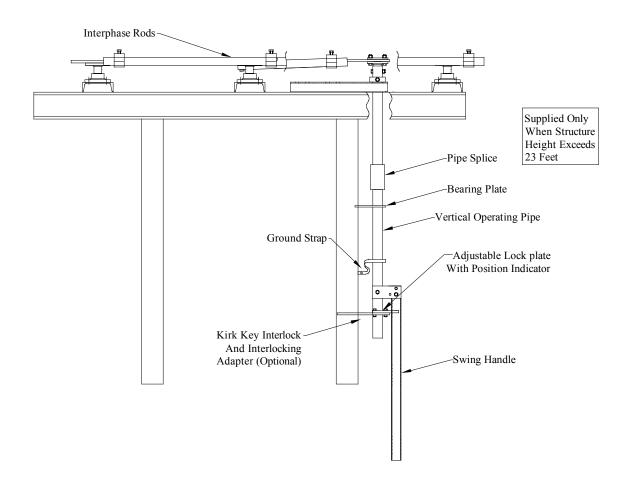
TYPICAL THREE-POLE FAS-3 SWITCH INSTALLATION
